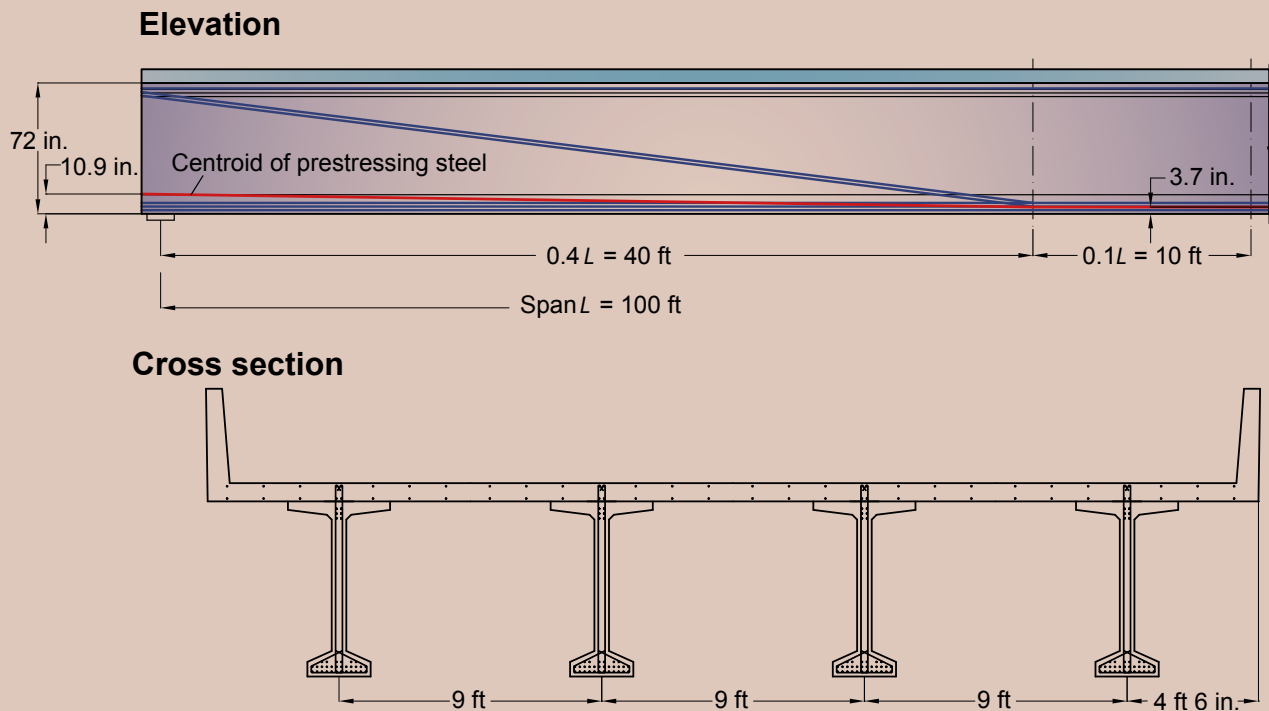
The design example's elevation and cross section are shown in detail. 1 in. = 25.4 mm; 1 ft = 0.3048 m.
